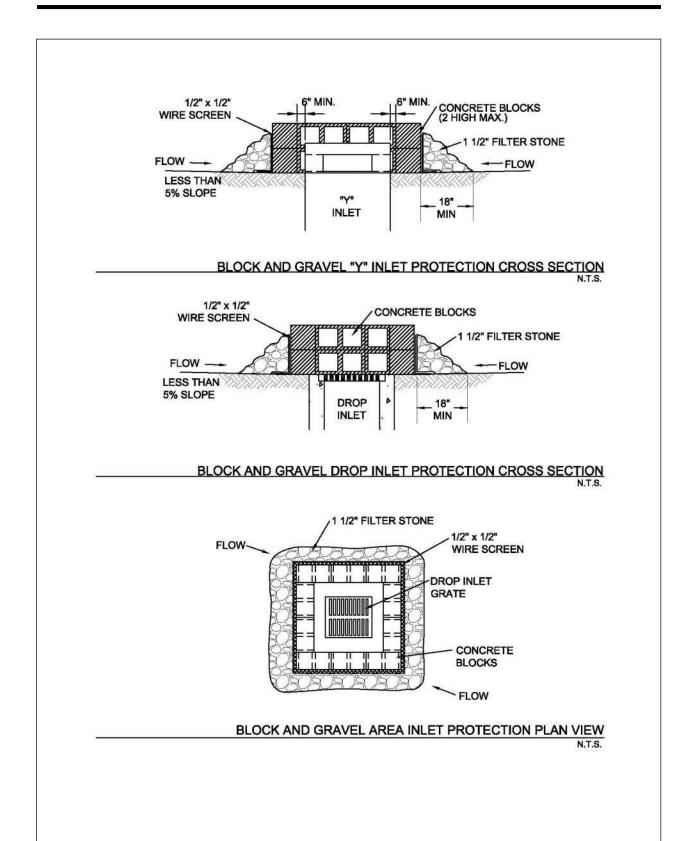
Schematics of Block and Gravel Area Inlet Protection (Source: Modified from City of Plano BMP SP-4)
